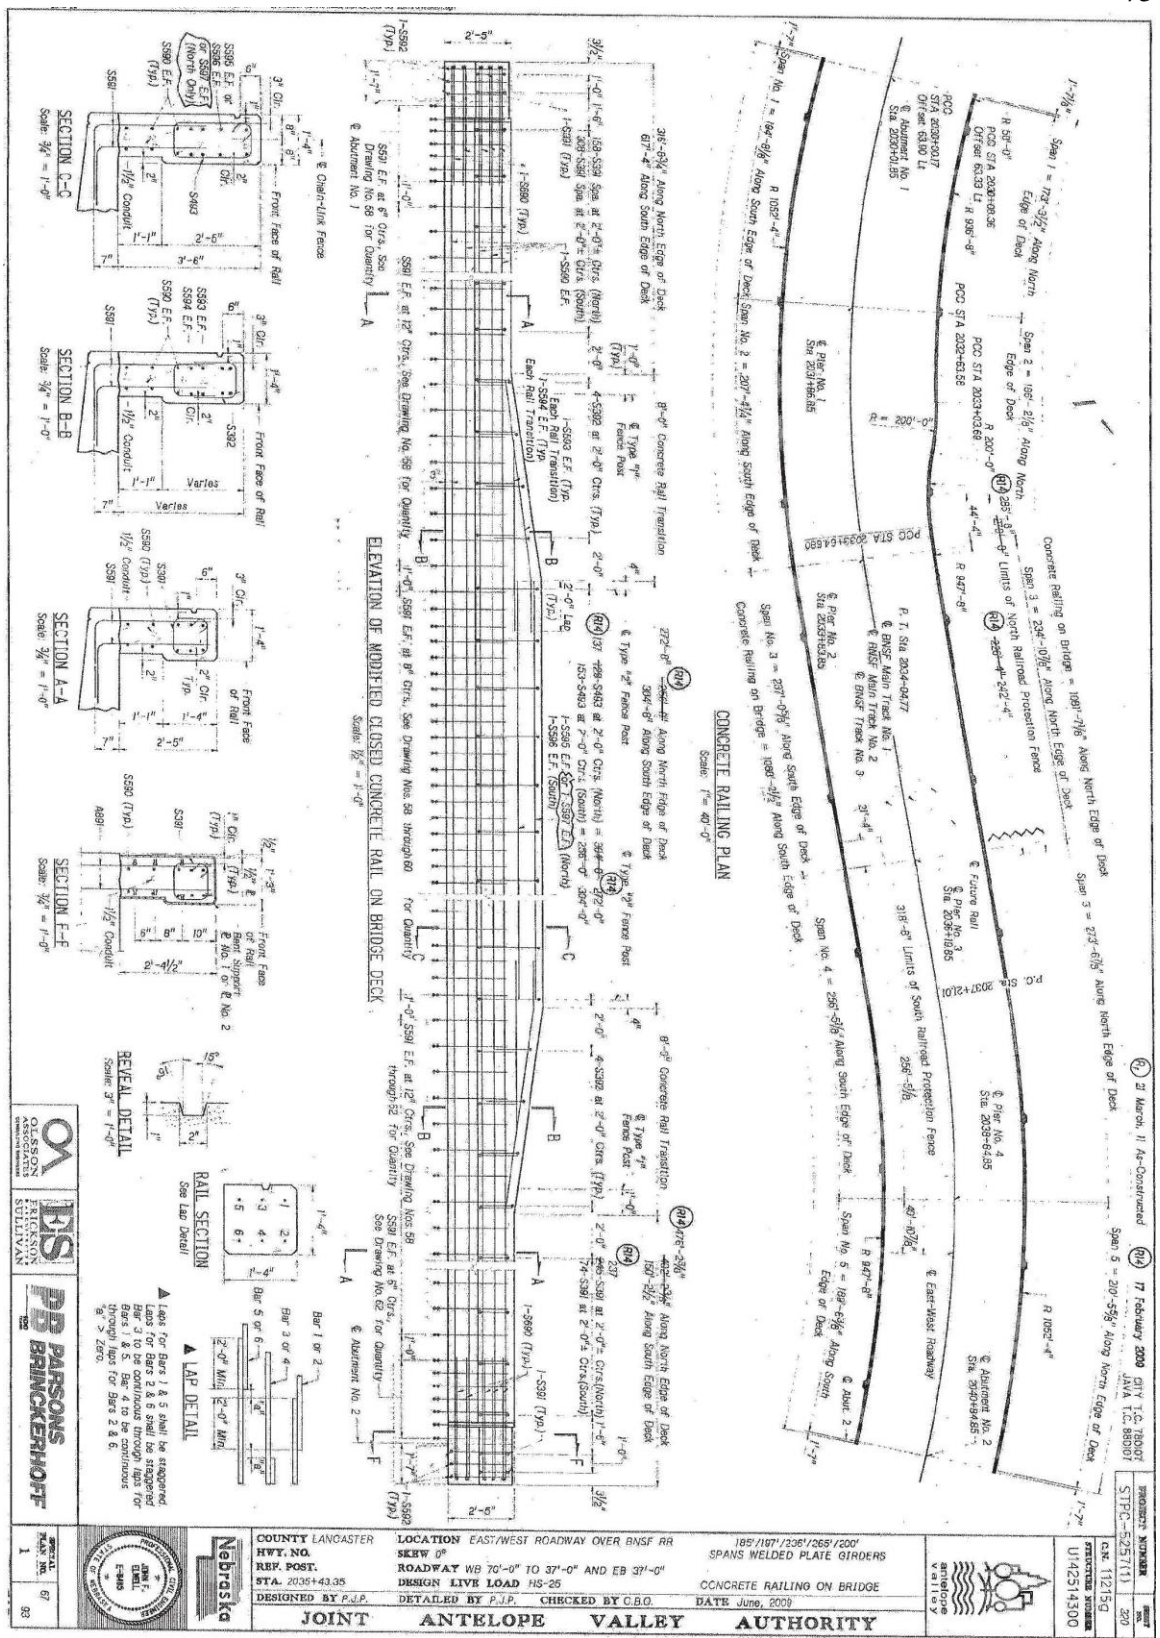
Aesthetic Debris Fence Bridge Rail Details
